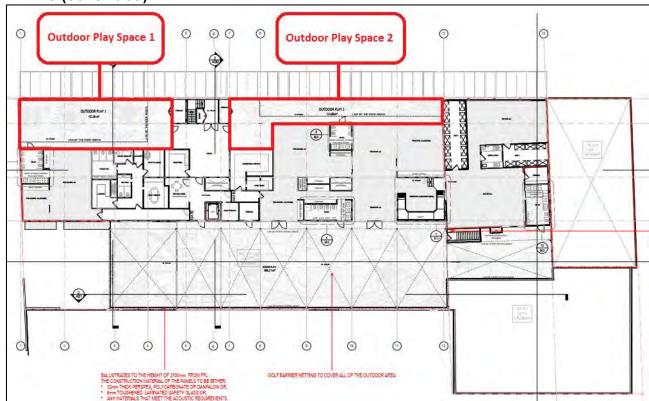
Proposed First Floor Plan indicating the location of outdoor play space 1 and 2 within the proposed childcare centre.
